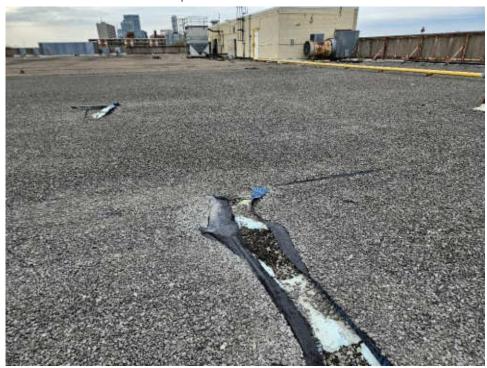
Example of Scoured Ballast, Torn Filter Fabric, and Exposed Insulation at IRMA Roof (Facing South)
